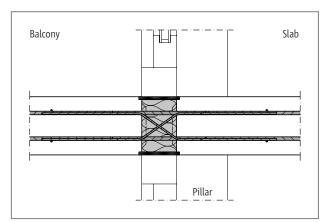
Schöck Isokorb® XT type D: One-way spanning
